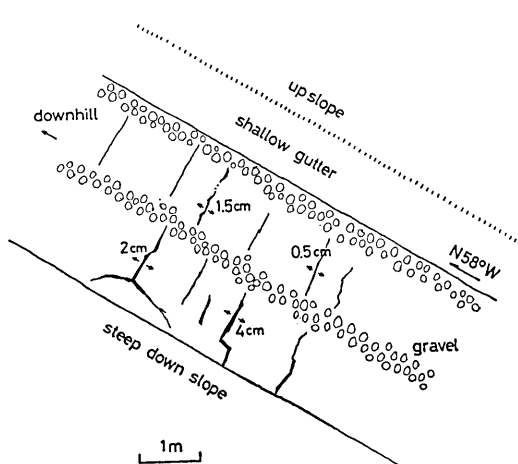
En echelon cracks on a road at Loc. h (north of Satomiya; see Fig. 32).
